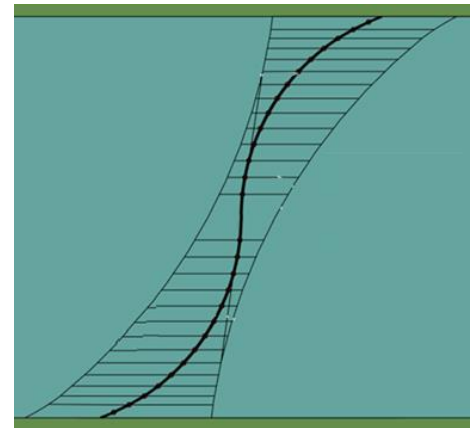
HORIZONTAL SUSPENSION ANCHORING SYSTEM [3]
